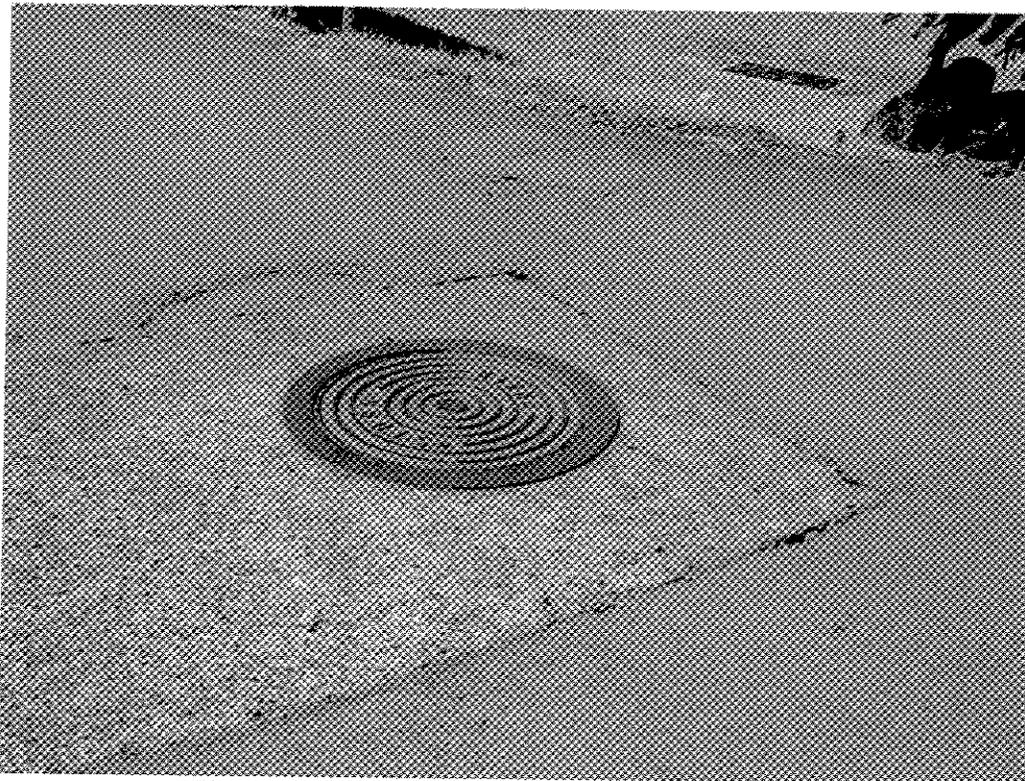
Inia Lane/Ilima Lane Intersection Drainage Manhole
